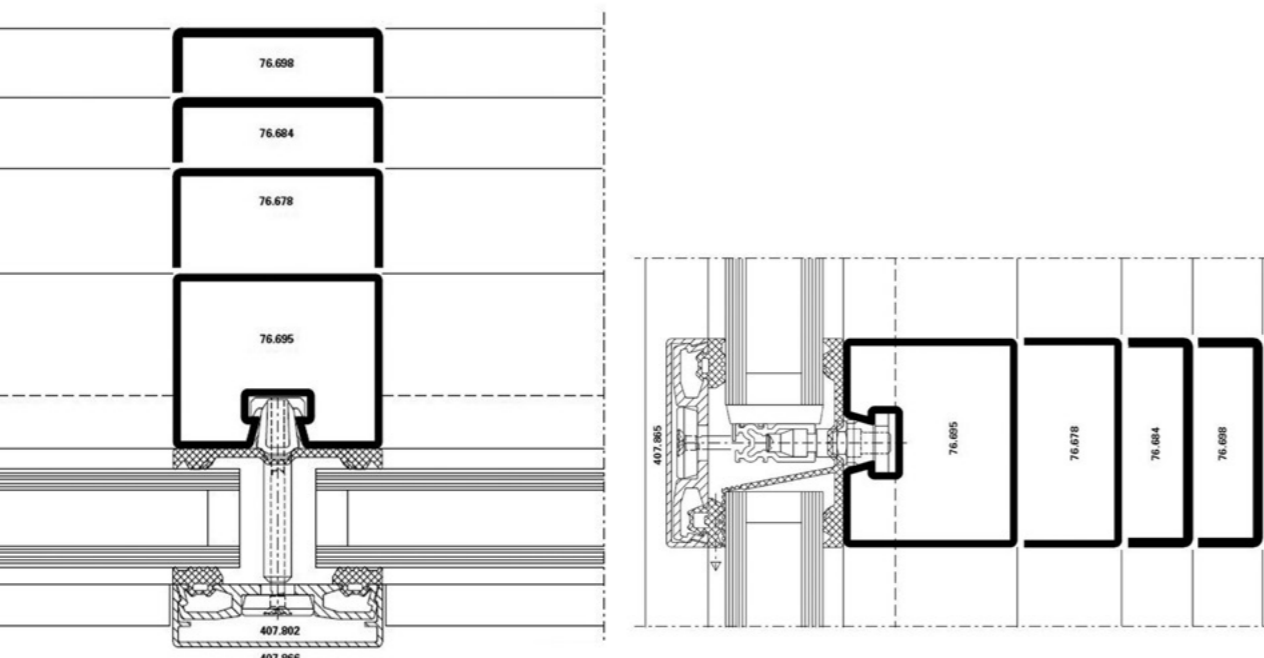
VISS TV detail plan and section (Source: ODS NL, 2021)
